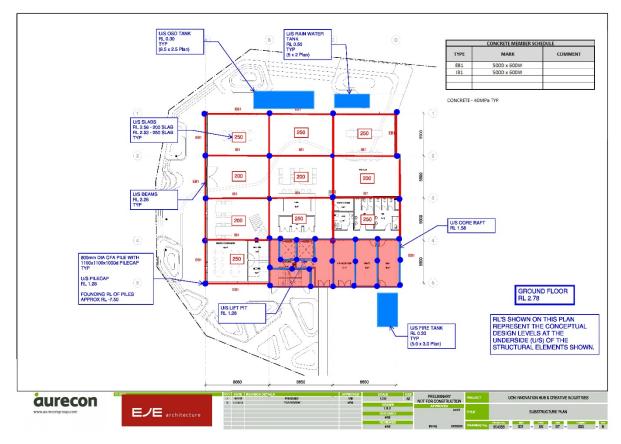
SUBSTRUCTURE PLAN FOR PROPOSED BUILDING A1 FOR STAGE 1A WORKS, PILES AND GRIDDED CONCRETE SLAB (SOURCE: AURECON 2018, REV B)
